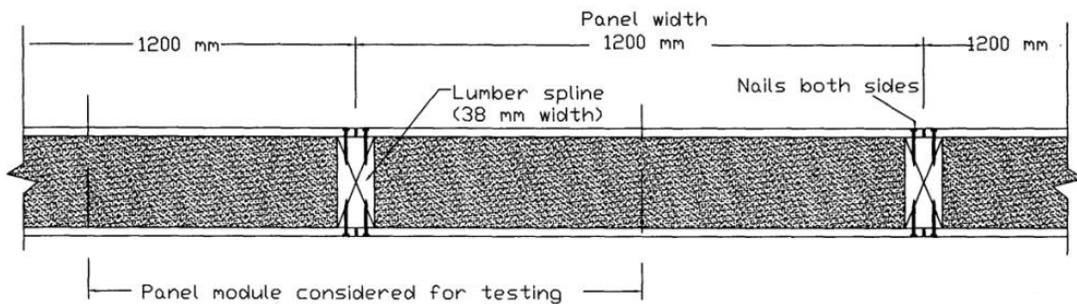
Typical section at panel lumber-spline connection before and after assembly
